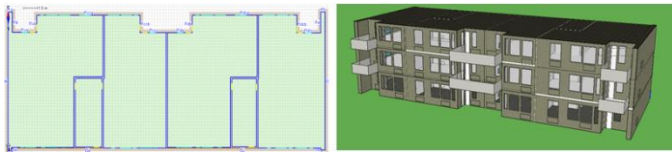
Floor plan shows the zone division of the housing units (left), 3D view of the modeled building in IDA ICE (right)
